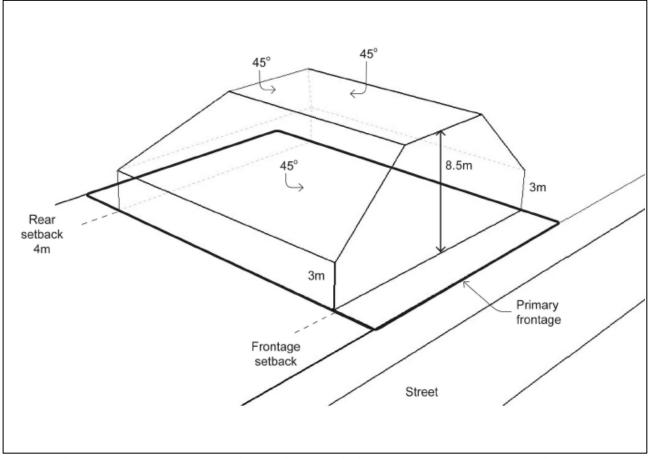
Acceptable 3-dimensional building envelope to comply with the Acceptable Solution for 10.4.2 (A3) – Setbacks and building envelope
